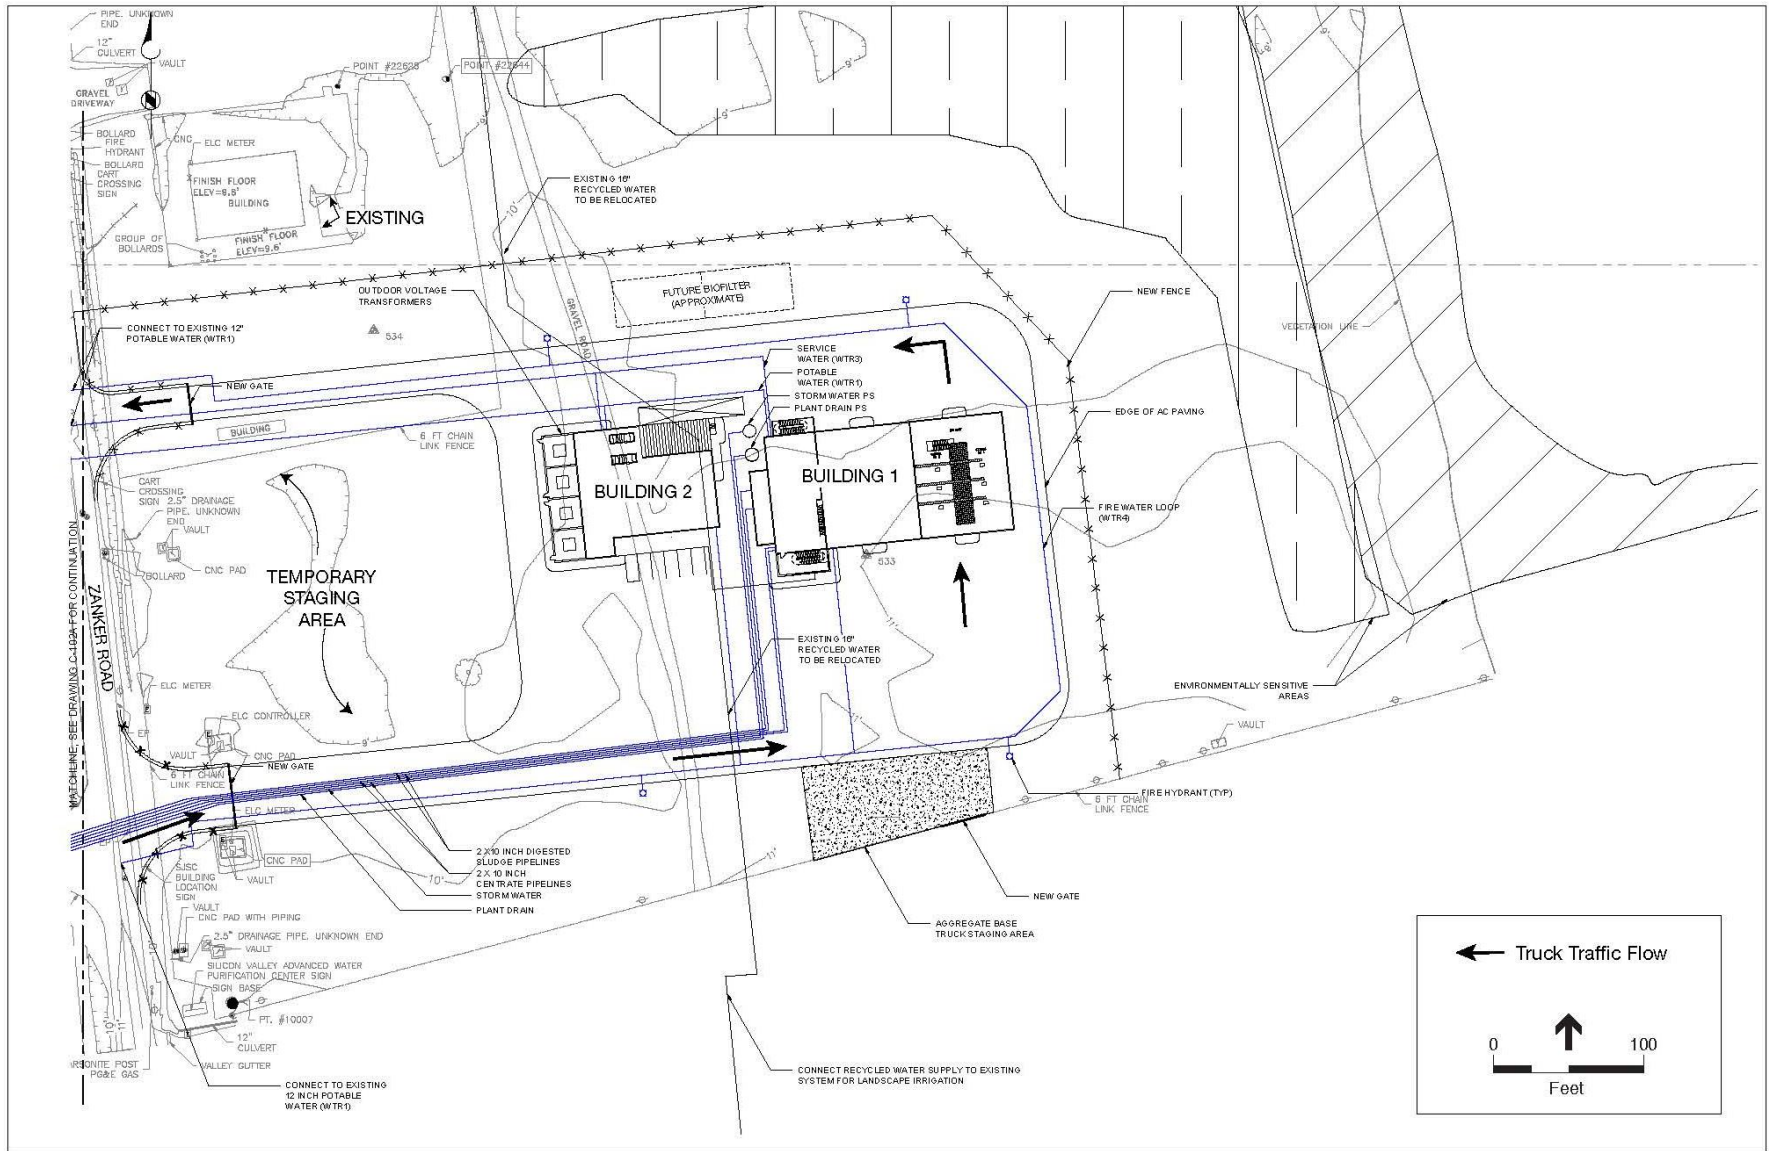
Indicative Design for Alternative 2 – 2-Story Building (Piston Pump), Setback of 120 Feet from Zanker Road
